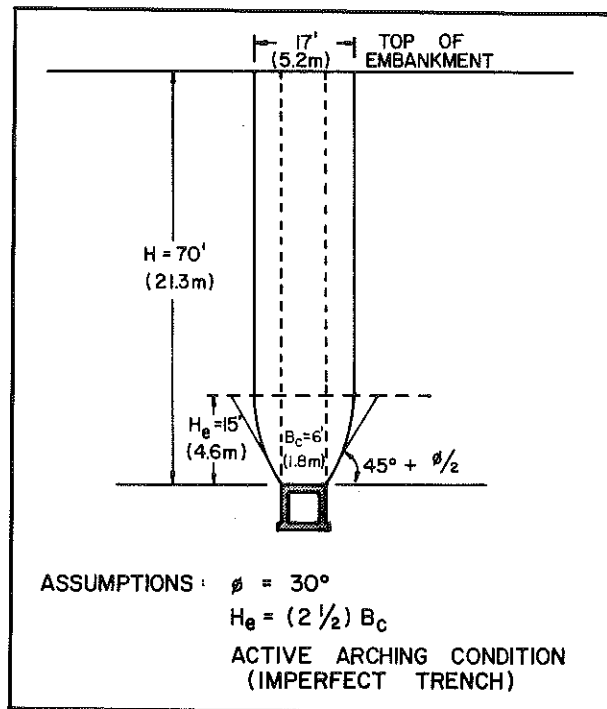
Determination of the Roadway Section Affected by Settlement above a Conduit, Considering the Active Arching Condition.
